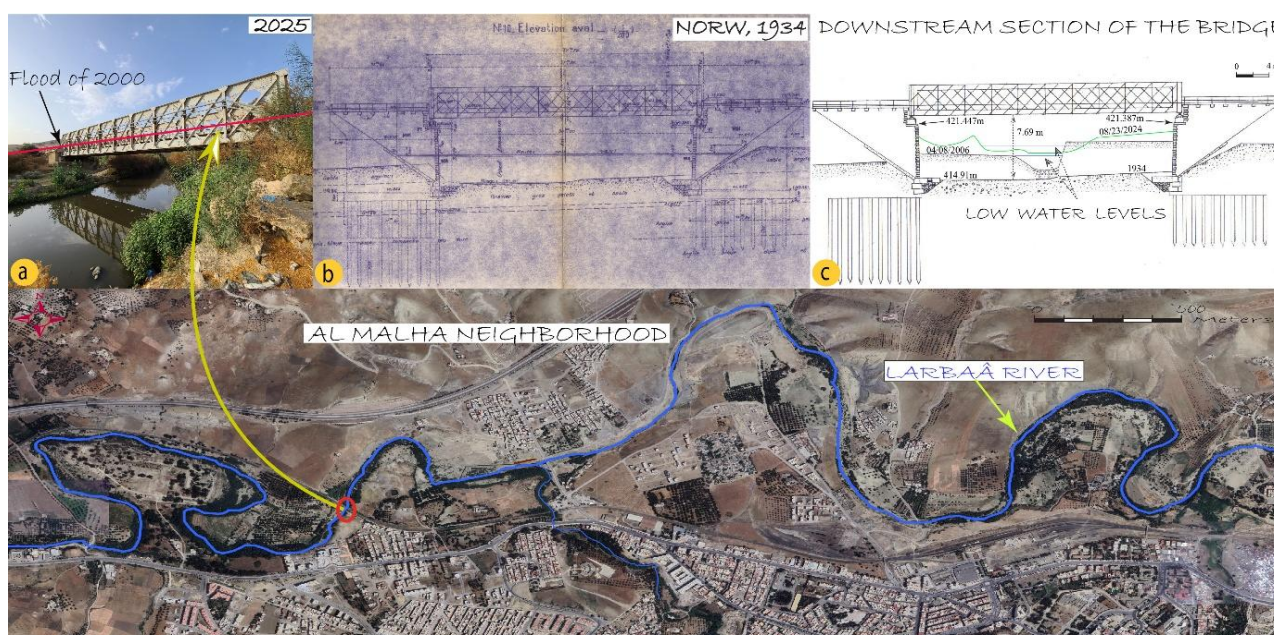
Railway bridge at kilometer 116. (a) Current conditions showing sediment accumulation. (b) Original 1934 construction plan (NORW, 2000). (c) Channel bed elevation changes over the past century.
